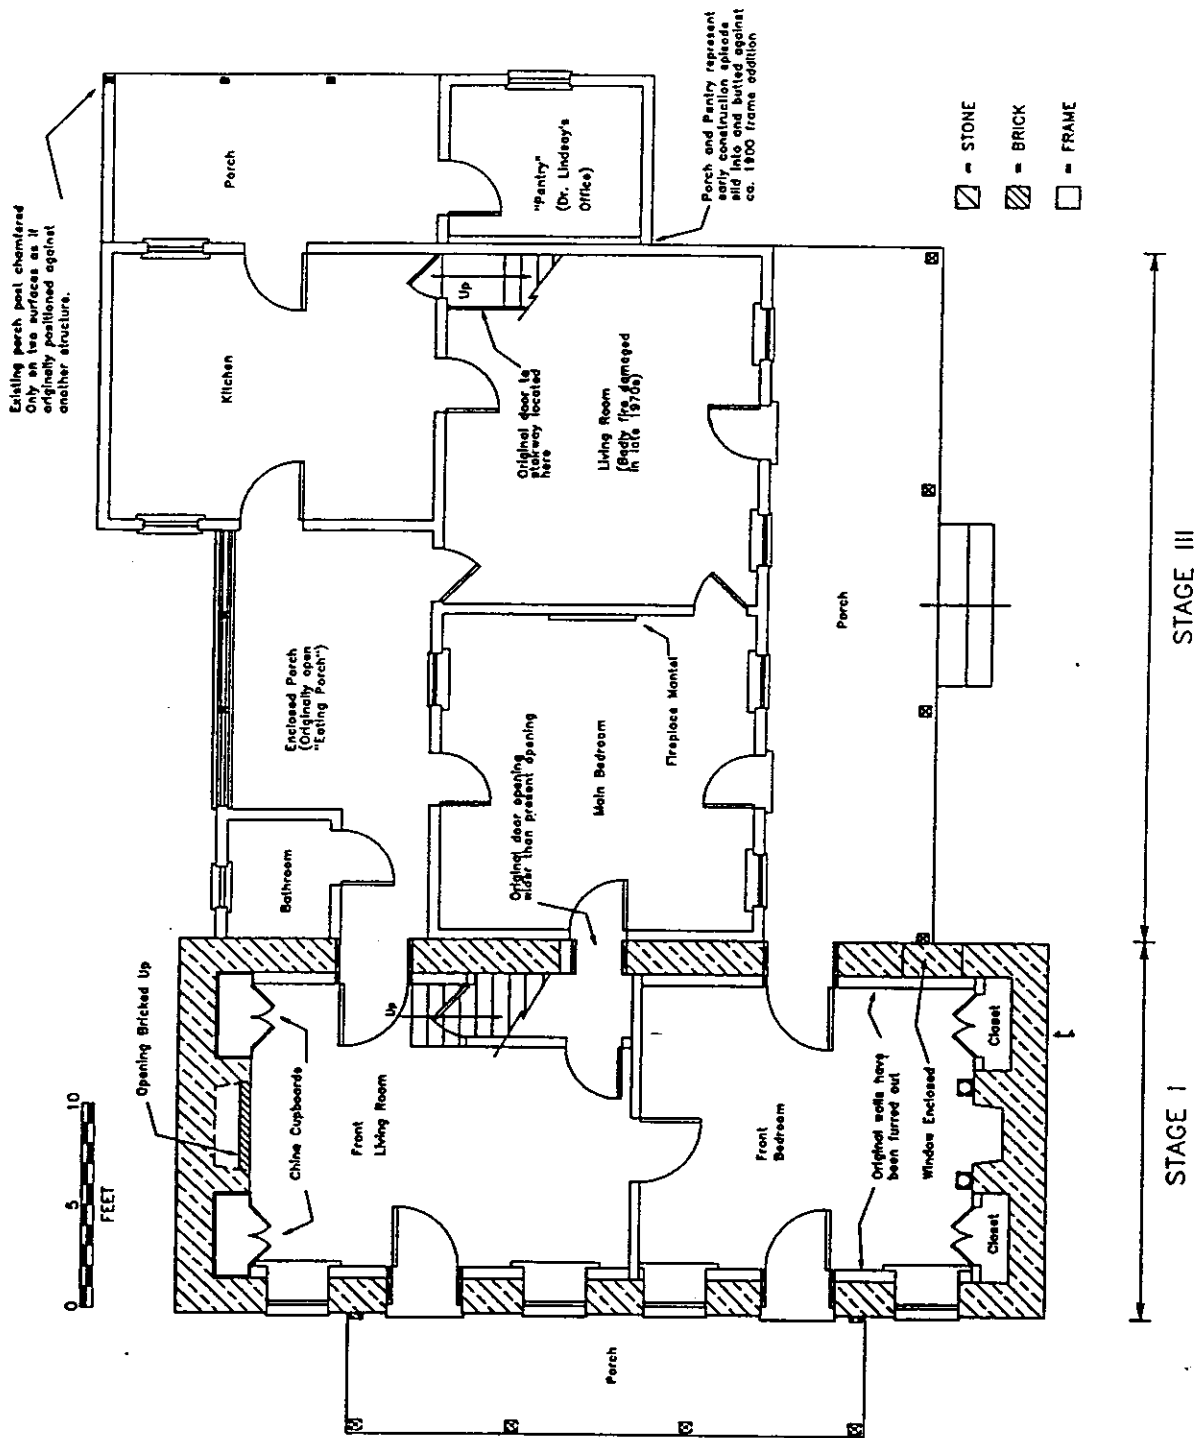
Existing first story floor plan of the George Brunk farm house, 1994.
